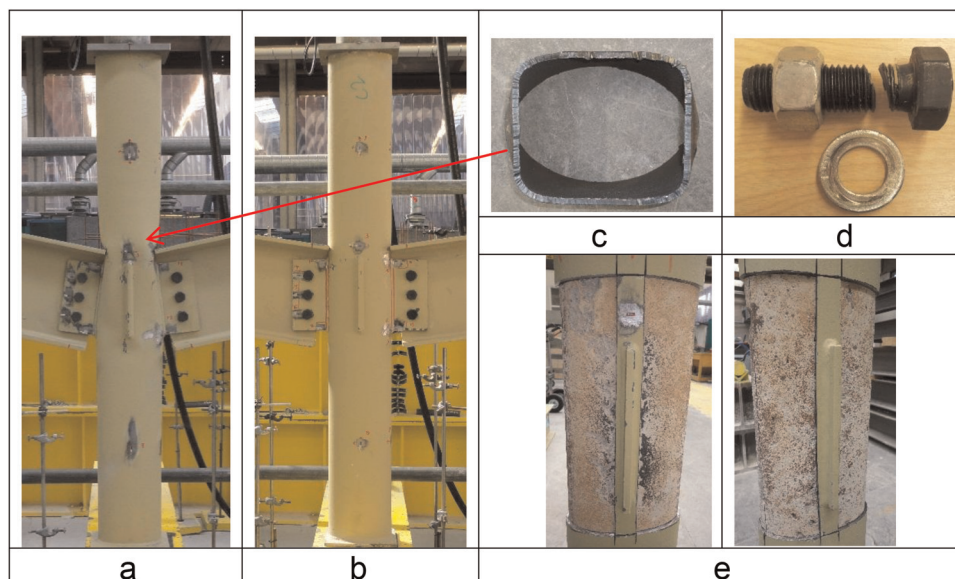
Failure of Type-A connections: (a) Joint-A; (b) Joint-AC; (c) worst section of Joint-A; (d) bolt failure of Joint-AC; and (e) core concrete of Joint-AC.
